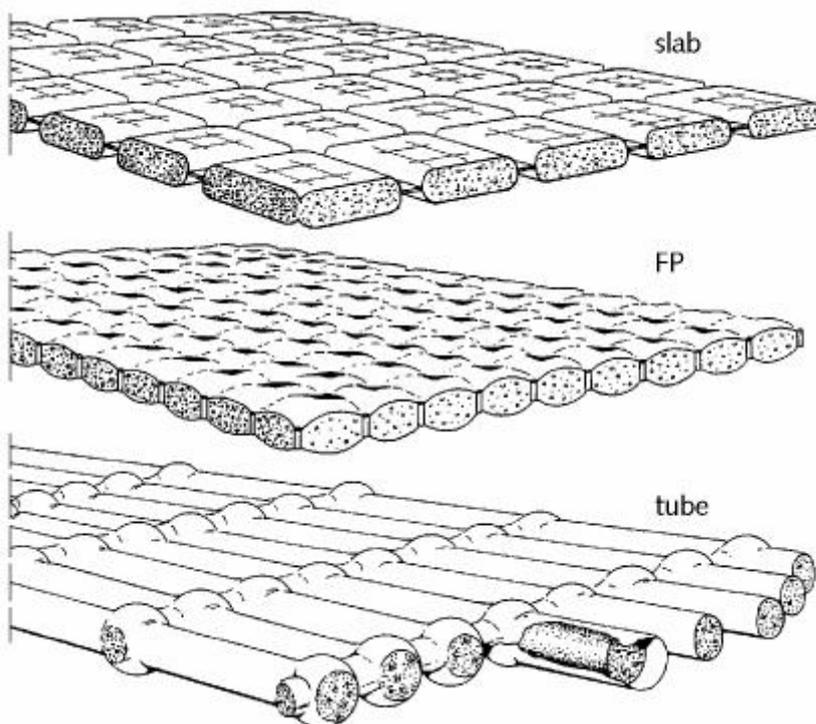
Example of concrete-filled mattresses (Source: Klein Breteler et al., 1998)
